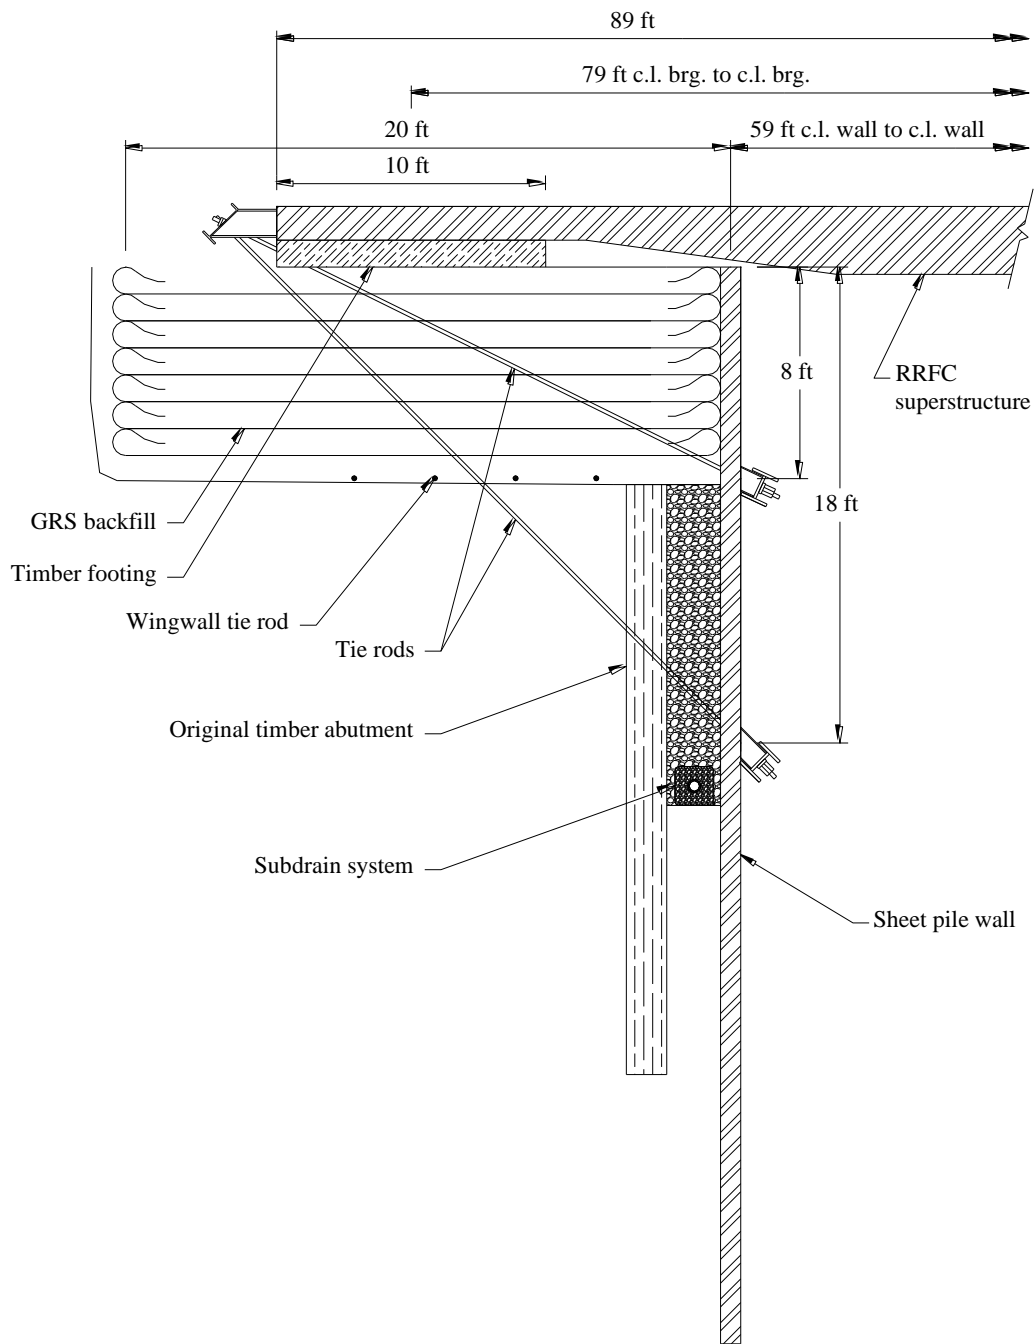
Design detail cross-section of TC, Iowa sheet pile bridge abutment and backfill retaining system for demonstration project
